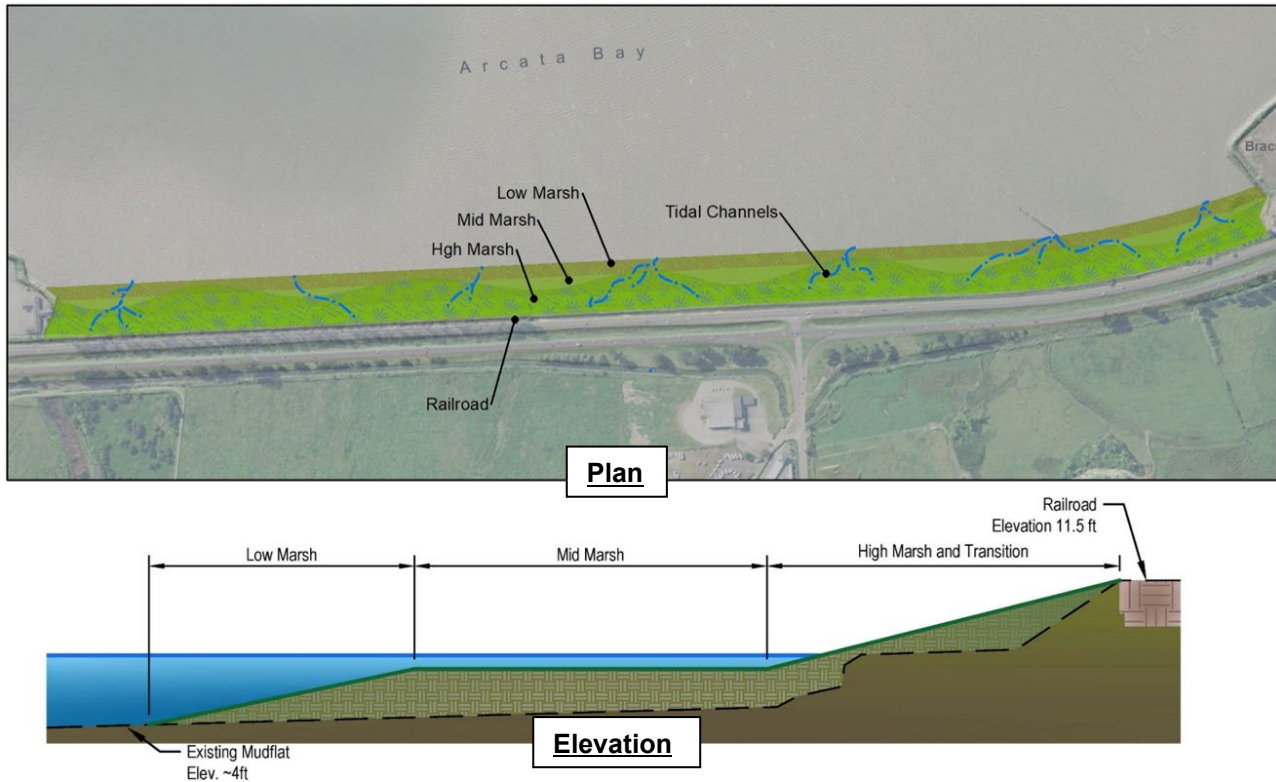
Plan and Elevation of Horizontal Levee: Low-, Mid- and High-Salt Marsh
